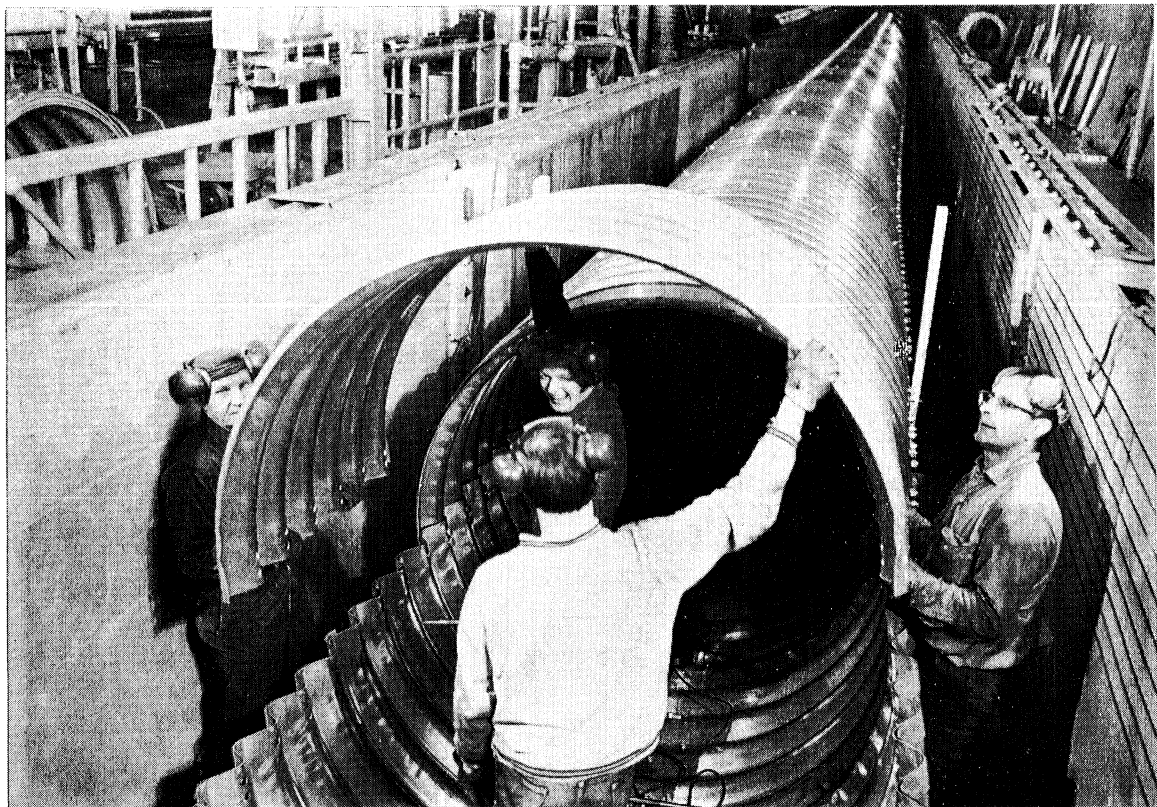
Assembly of the 66 in. Bolted Pipe
